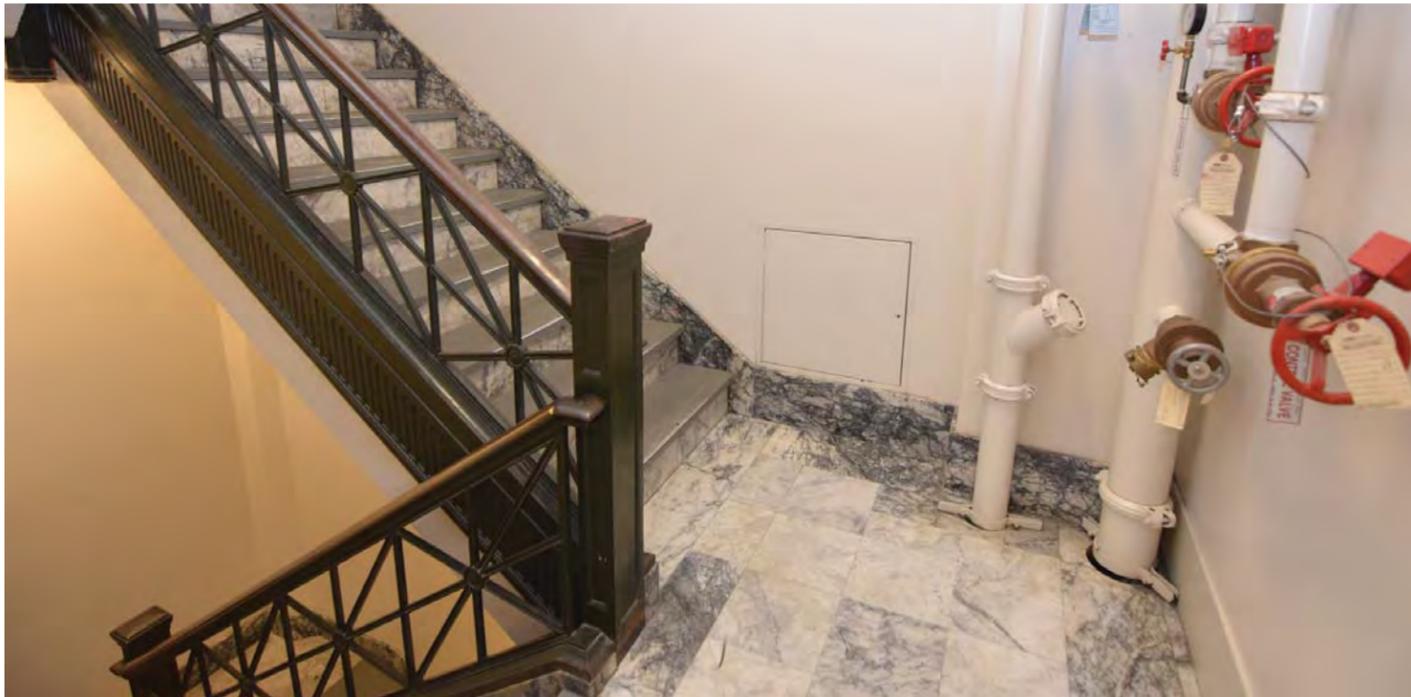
at level 5. The existing handrail is non-code compliant and may need to be upgraded if the building is substantially altered. CDG photo, May 7, 2016.
